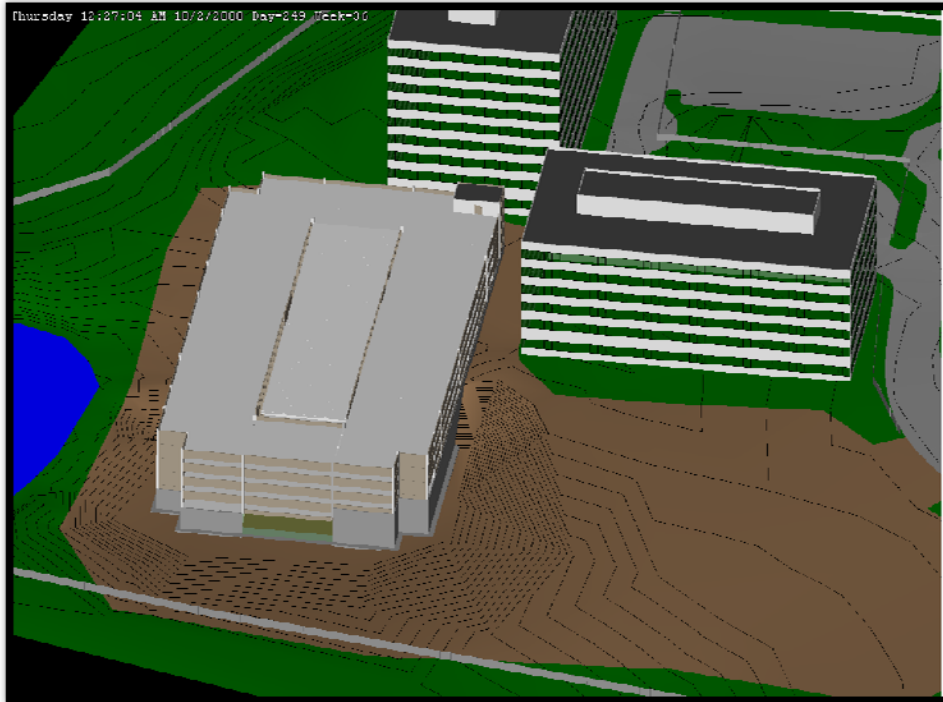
Phase 2 Footing and Foundation Wall Construction
